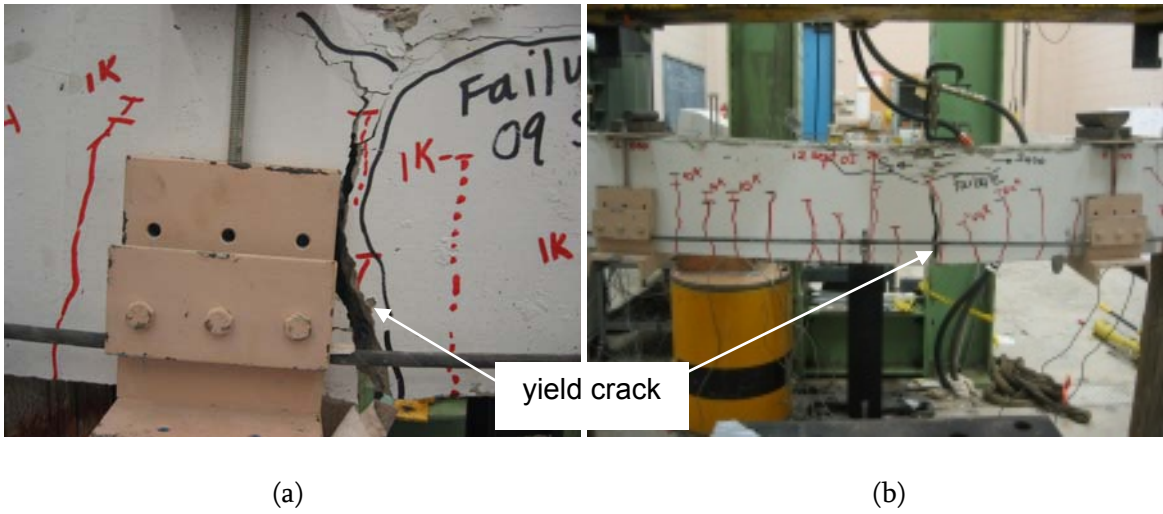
Typical failure of the OL15-group of beams: fatigue fracture at the location of yield crack for the beams (a) OL15-F76, and (b) OL15-F88
